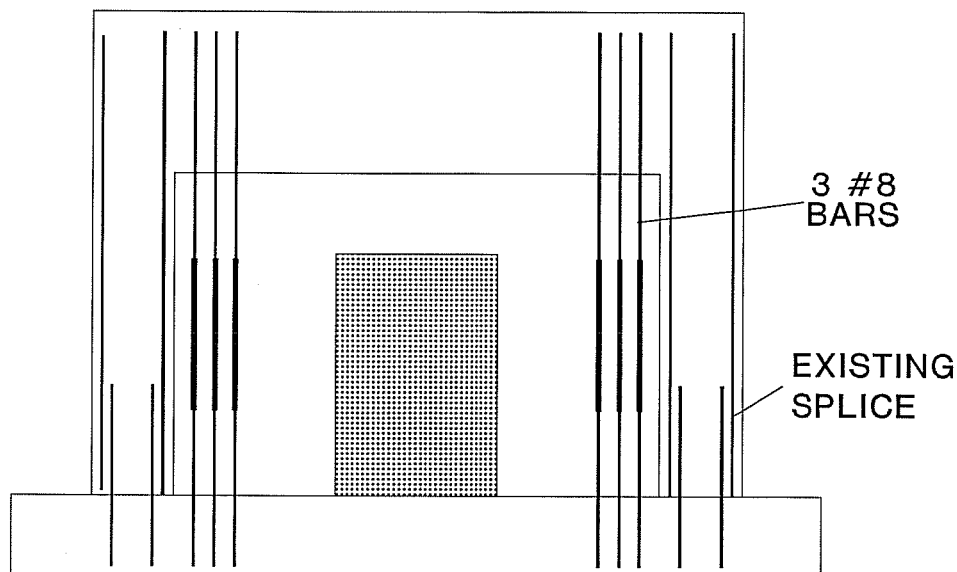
Vertical reinforcement schematic of Shah's specimen.
